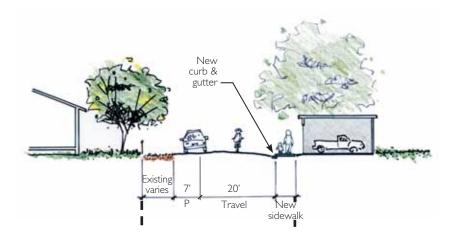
Recommended configuration for narrow streets, showing with a sidewalk on one side.
